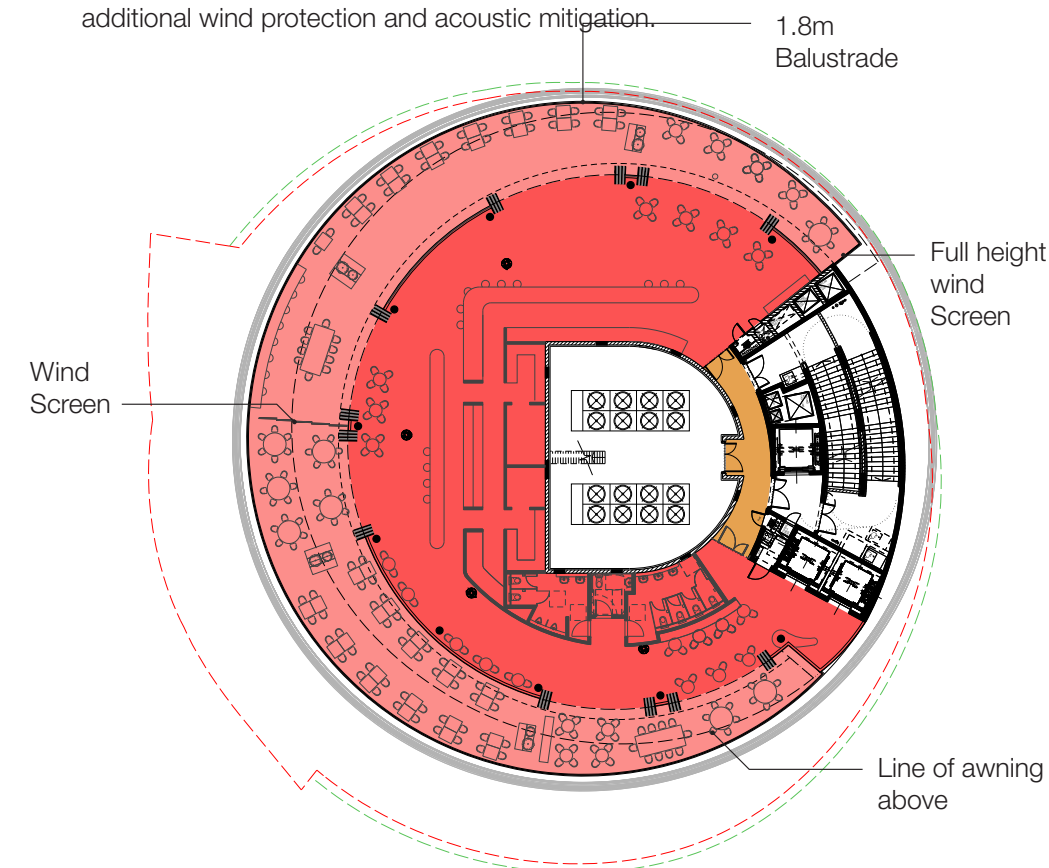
Proposed Ground Level 5 Plan - retractable wind screen + balustrade extent highlighted
